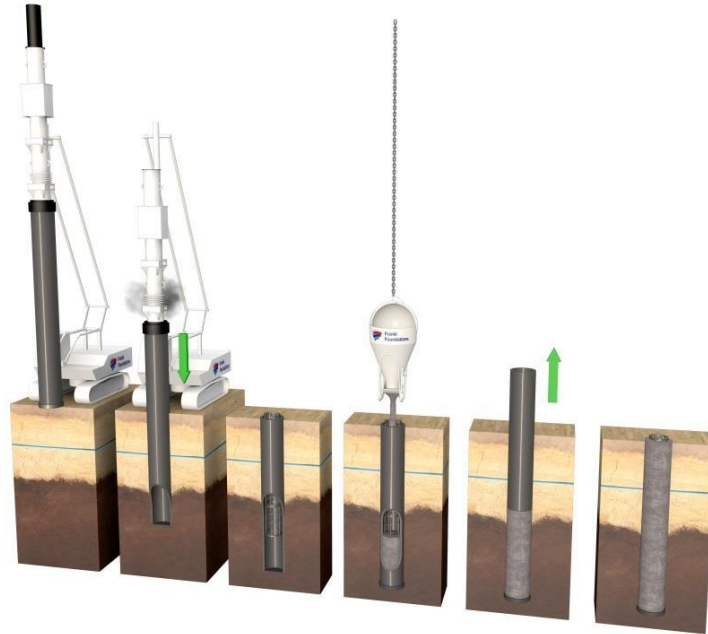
Cast-in-place concrete pile construction sequence (Courtesy of Franki Foundations S.A.)
